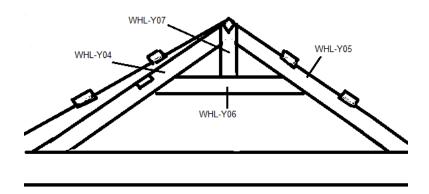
Sketch of truss 2, showing the location of samples WHL-Y04-07
